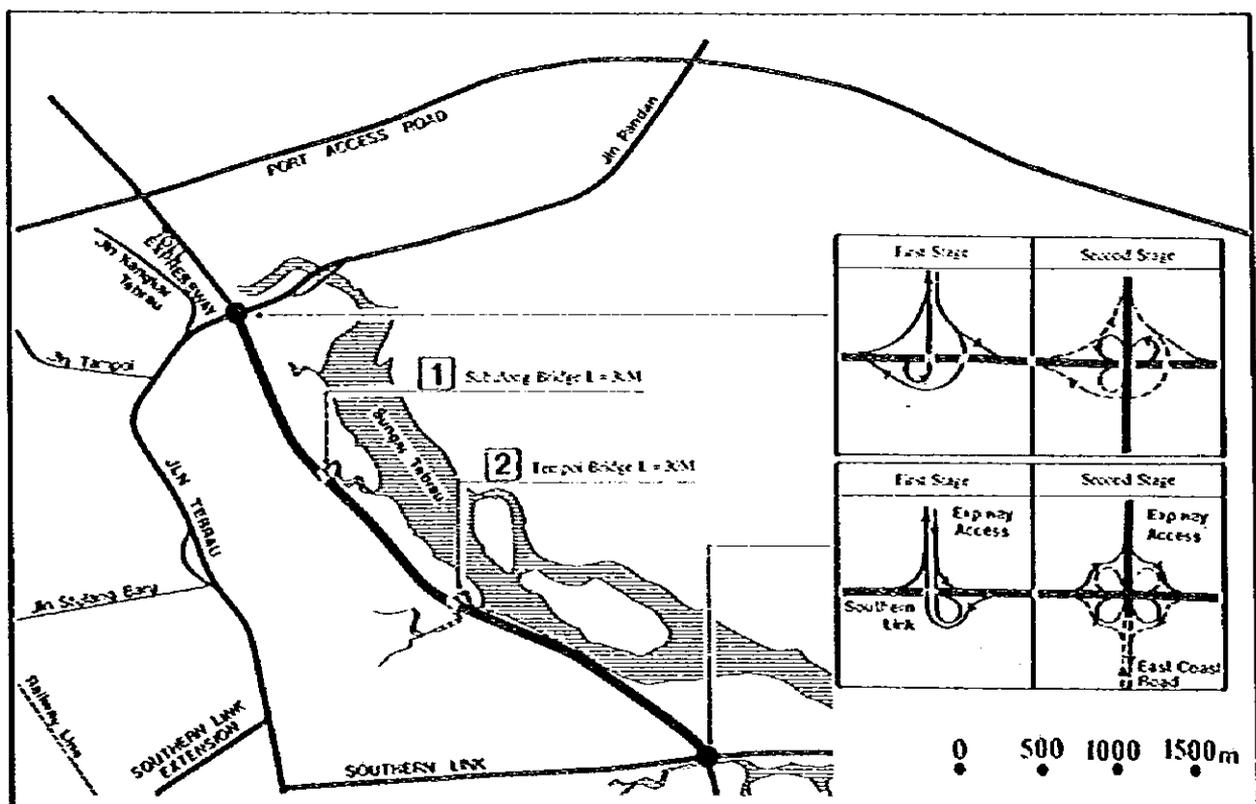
RECOMMENDED INTERCHANGE/BRIDGE PLAN FOR THE TOLL EXPRESSWAY ACCESS ROAD
